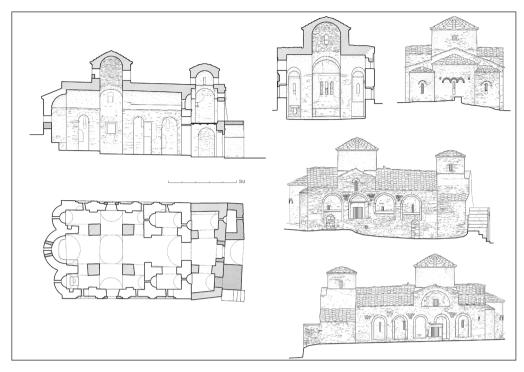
Agioi Apostoloi at Metochi. Plan, sections, north, south and east elevations.
